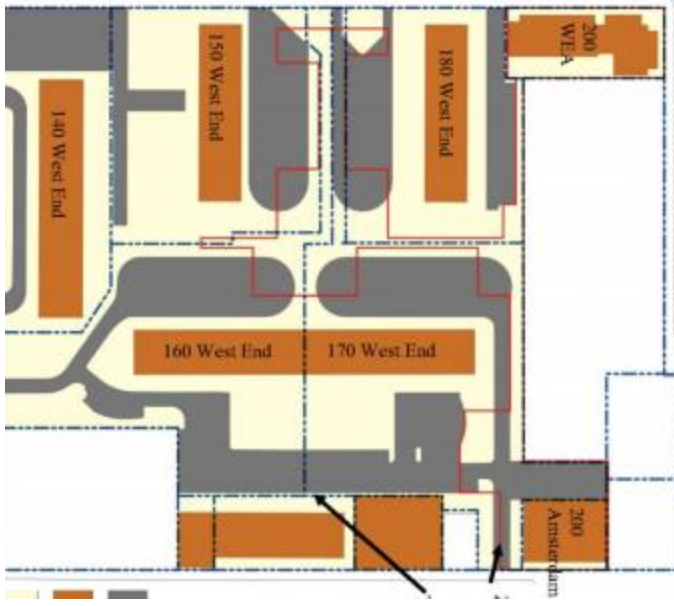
Aerial image showing proposed tower at 200 Amsterdam Avenue and zoning lot in red
